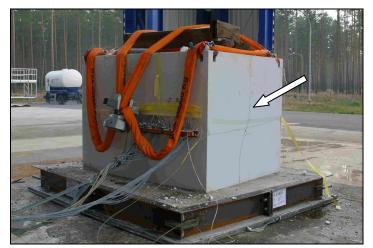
Crack in a side wall of container GC FORM II after the test
